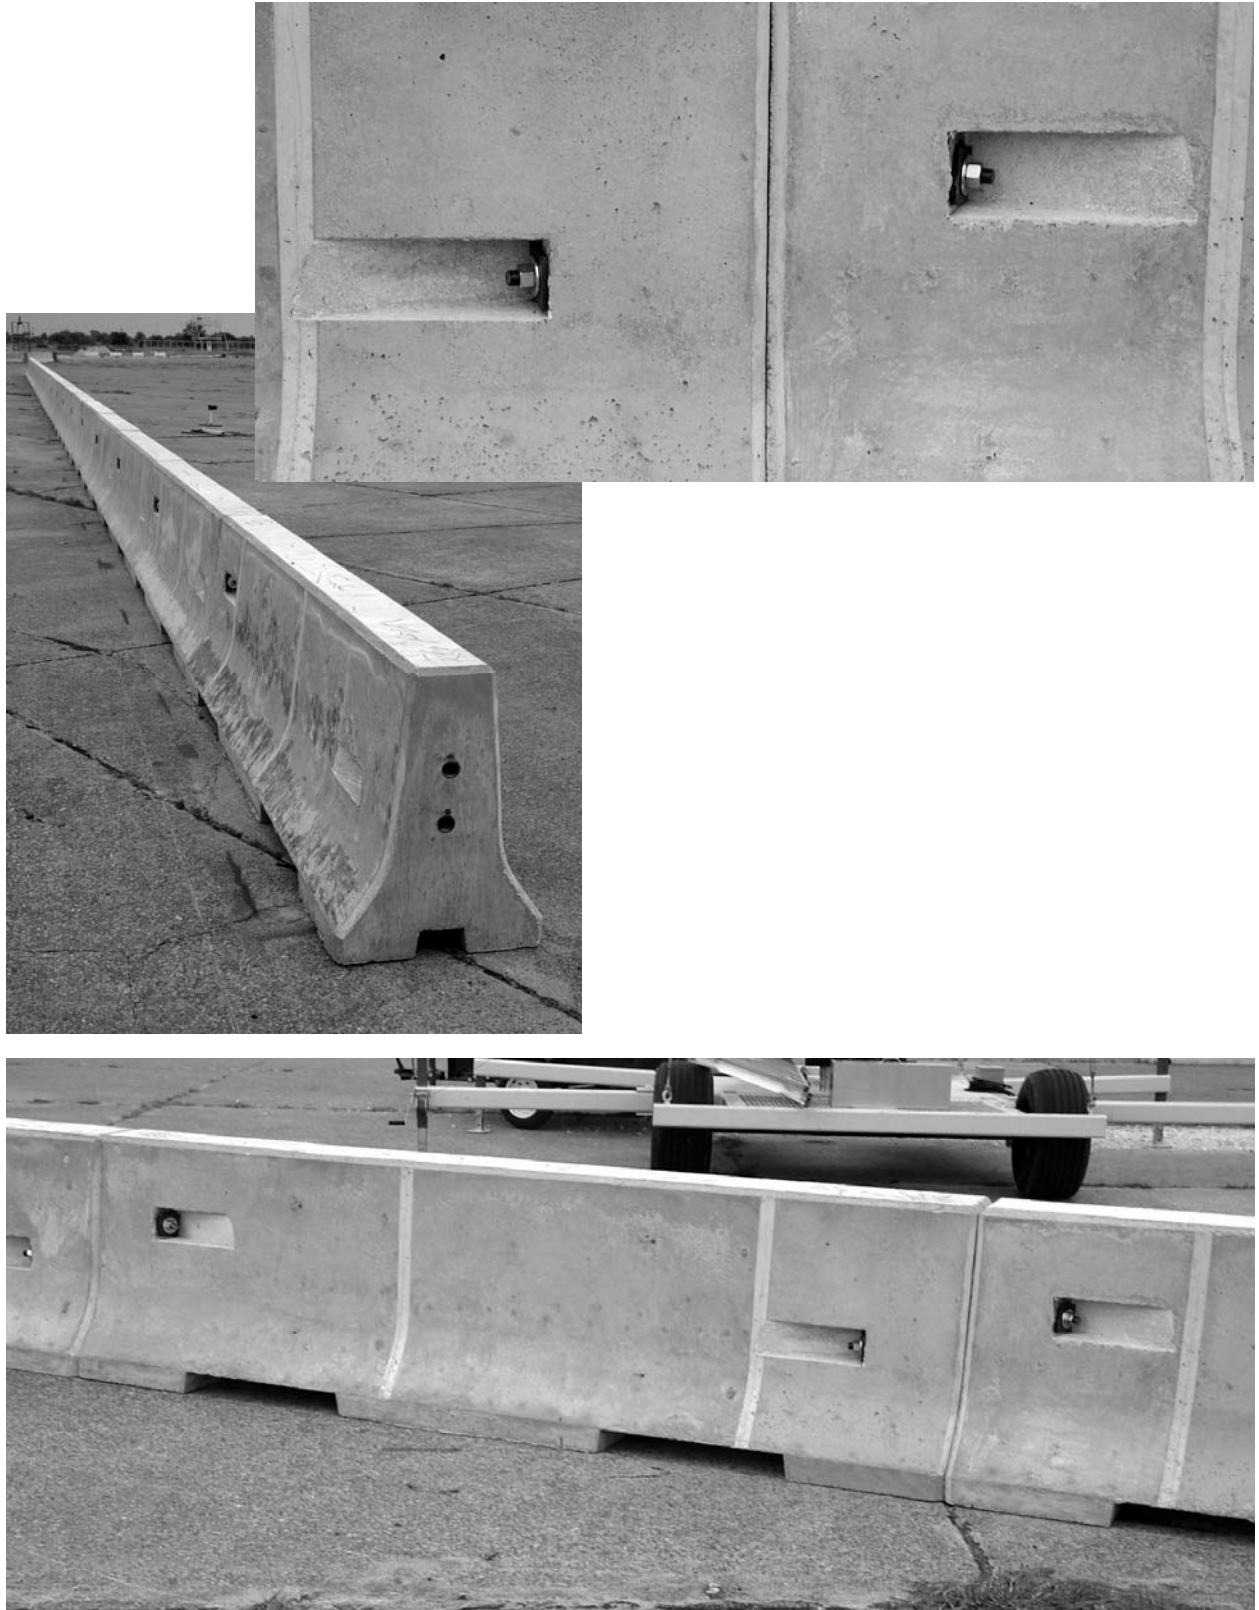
Cross-Bolt Concrete Median Barrier before Test 446924-1.
